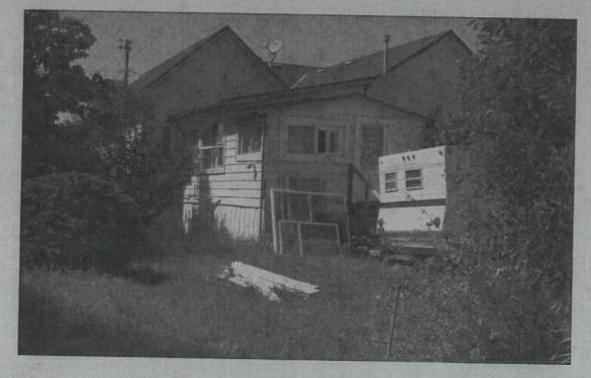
Looking northeast at south and east sides, 10 April 2015.
